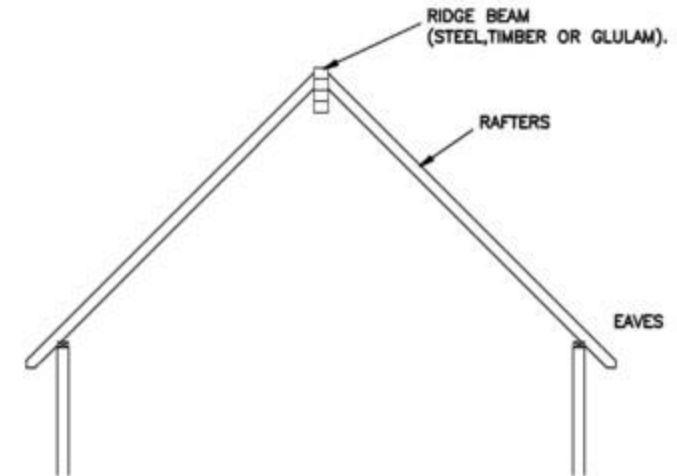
VAULTED ROOF WITH RIDGE BEAM.
